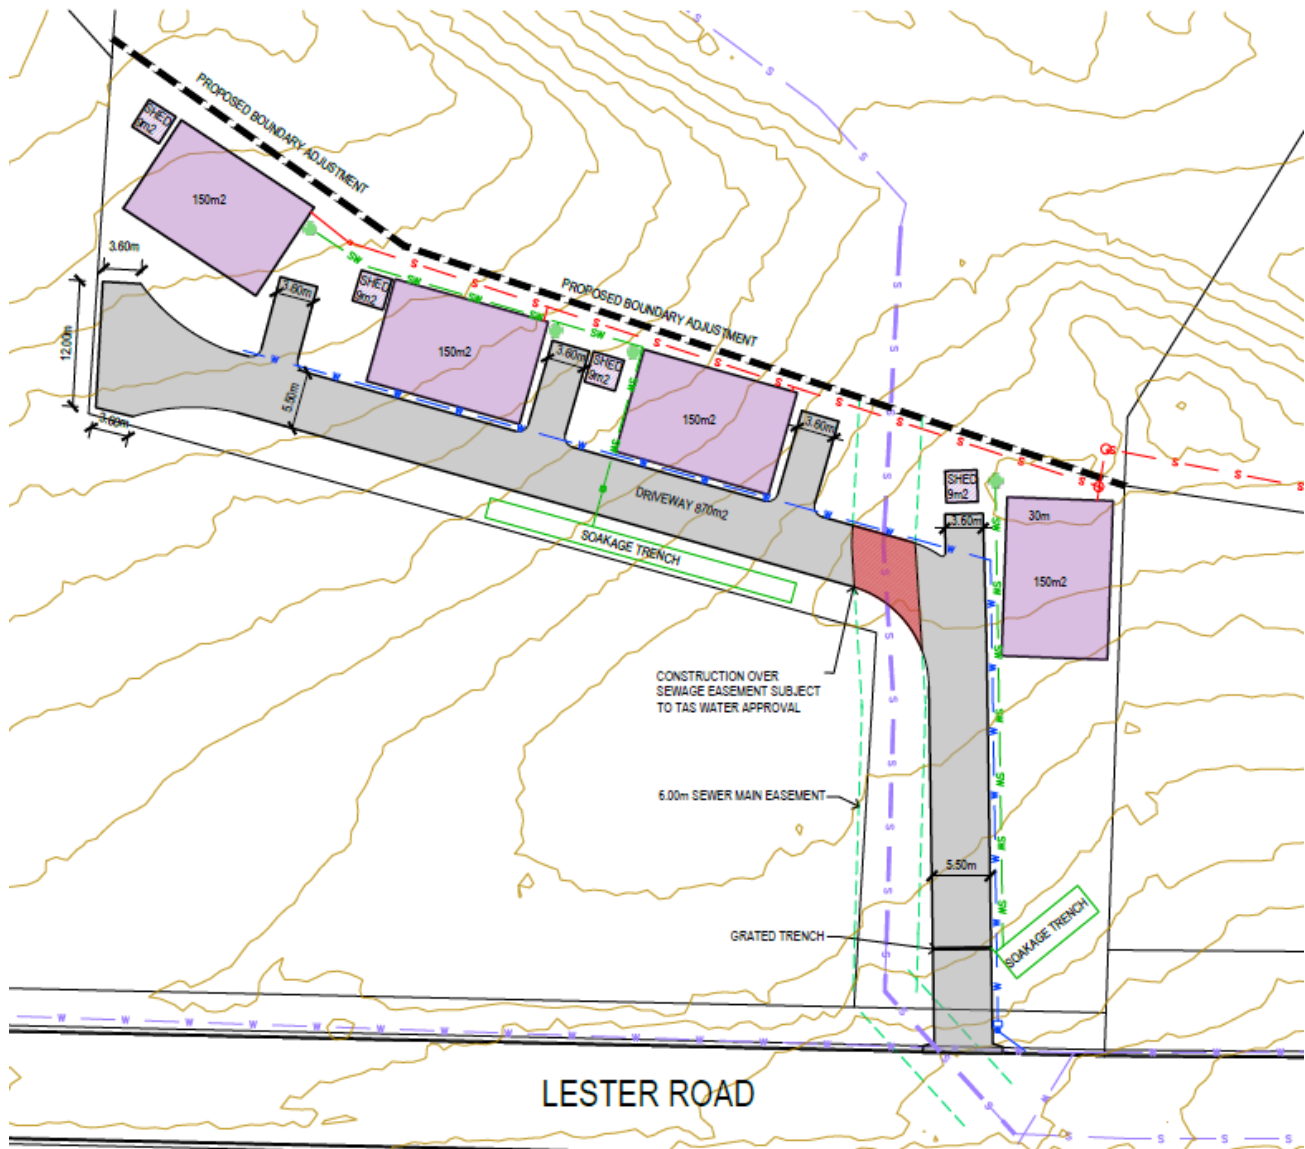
Indicative site capacity testing plan (Source: Flussig Engineers)
